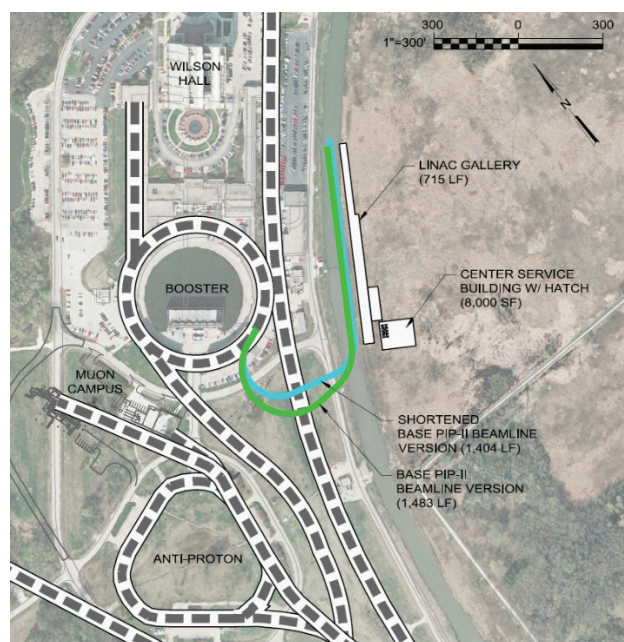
Layout of Fermilab site with PIP-II beam lines.
